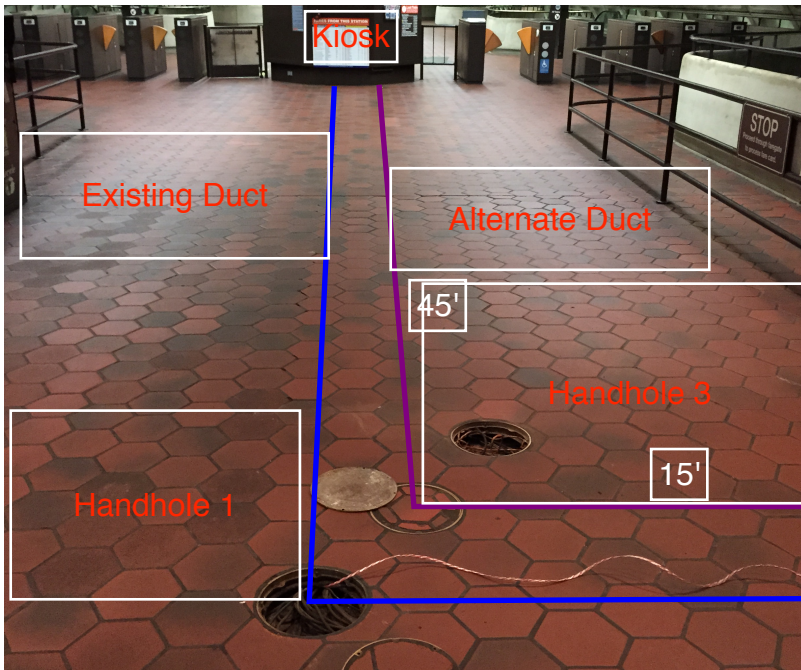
Existing / Alternate Ducts on mezzanine floor.
